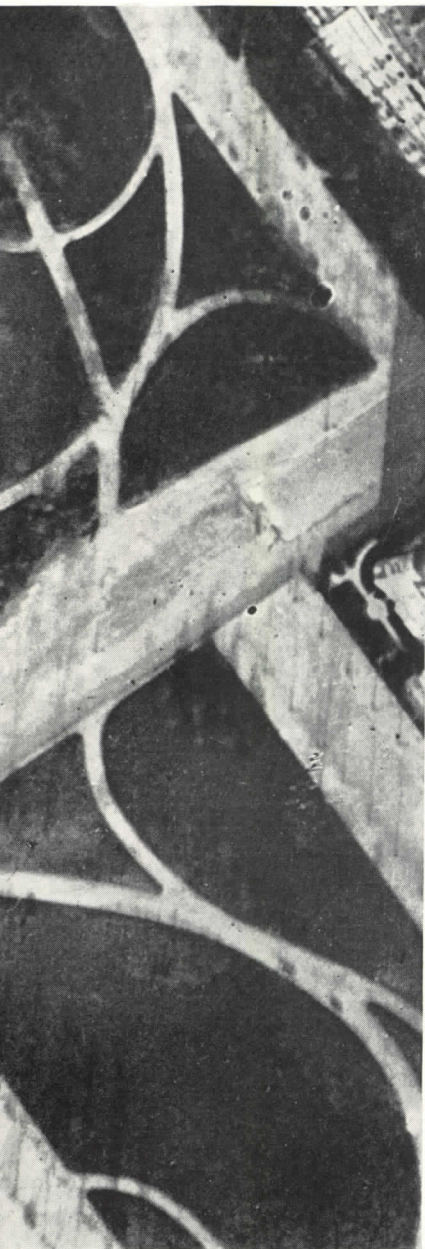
Eiffel's foundations, although executed in stone masonry, anticipate reinforced-concrete design to a surprising degree. Photo taken April 20, 1887.
